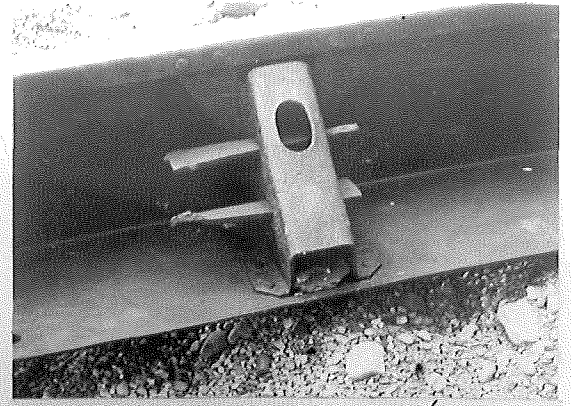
View of stake pocket on an old C form showing method of attachment and the double stake locks.
